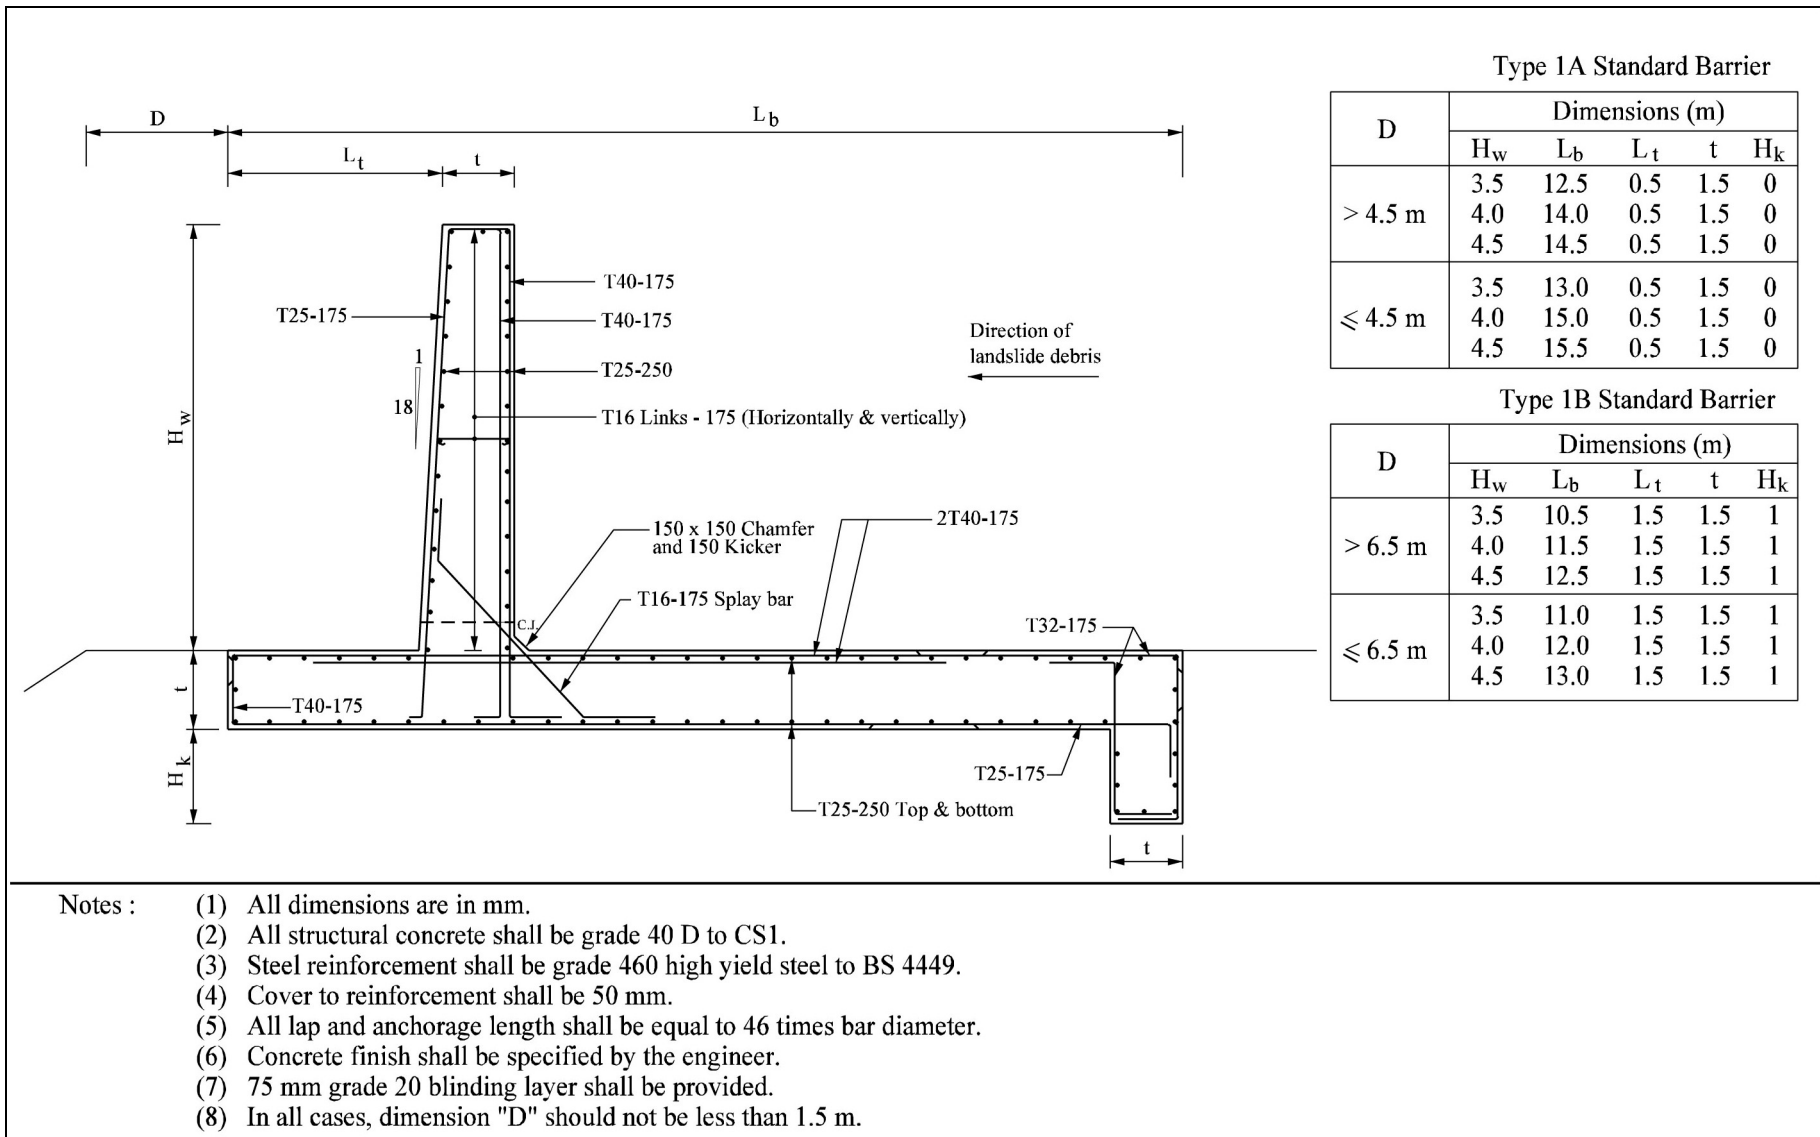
Reinforced Concrete Barrier (Type 1 Barrier)
